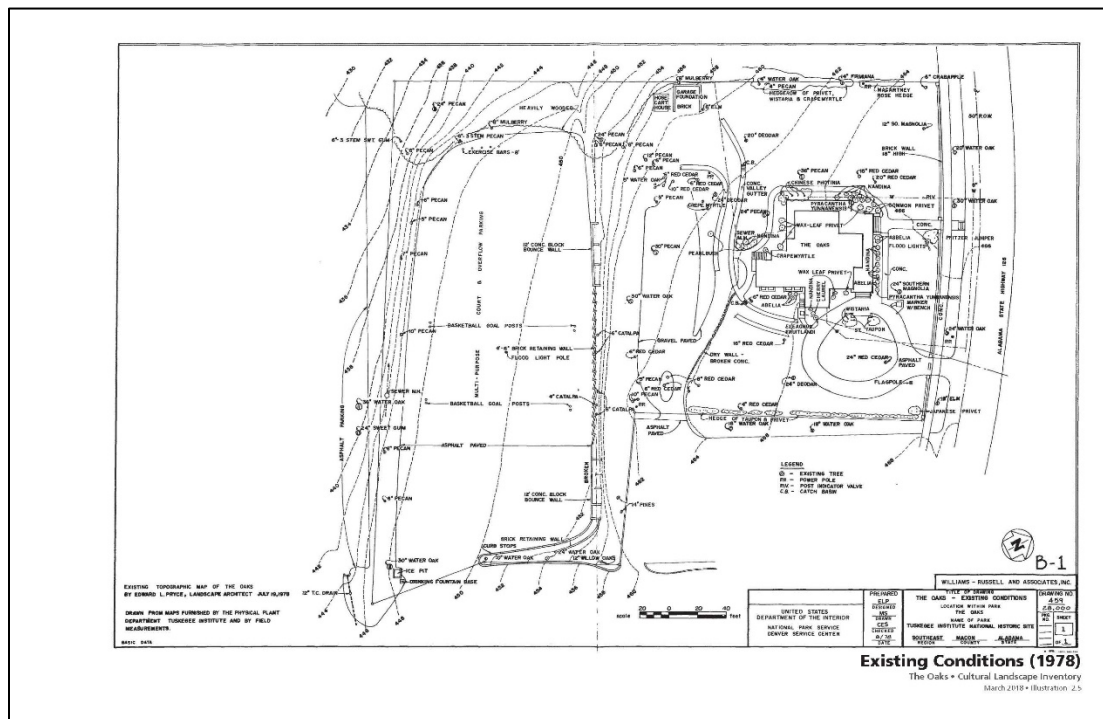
1978 Existing Conditions Plan, Williams-Russell and Associates, etc
